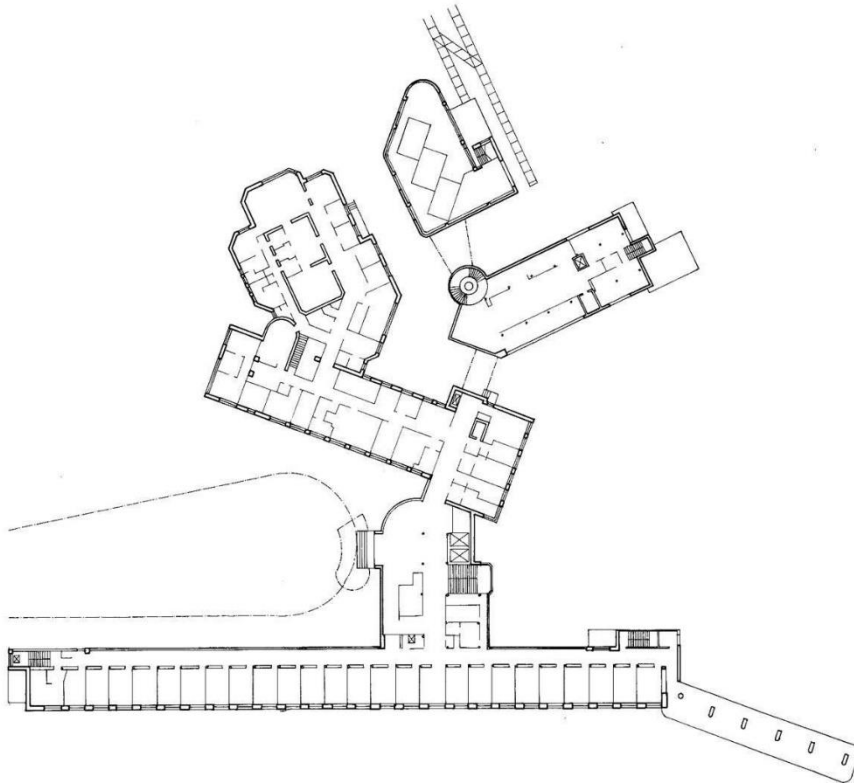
Paimio Sanatorium, Ground Floor Plan, 1929-33
